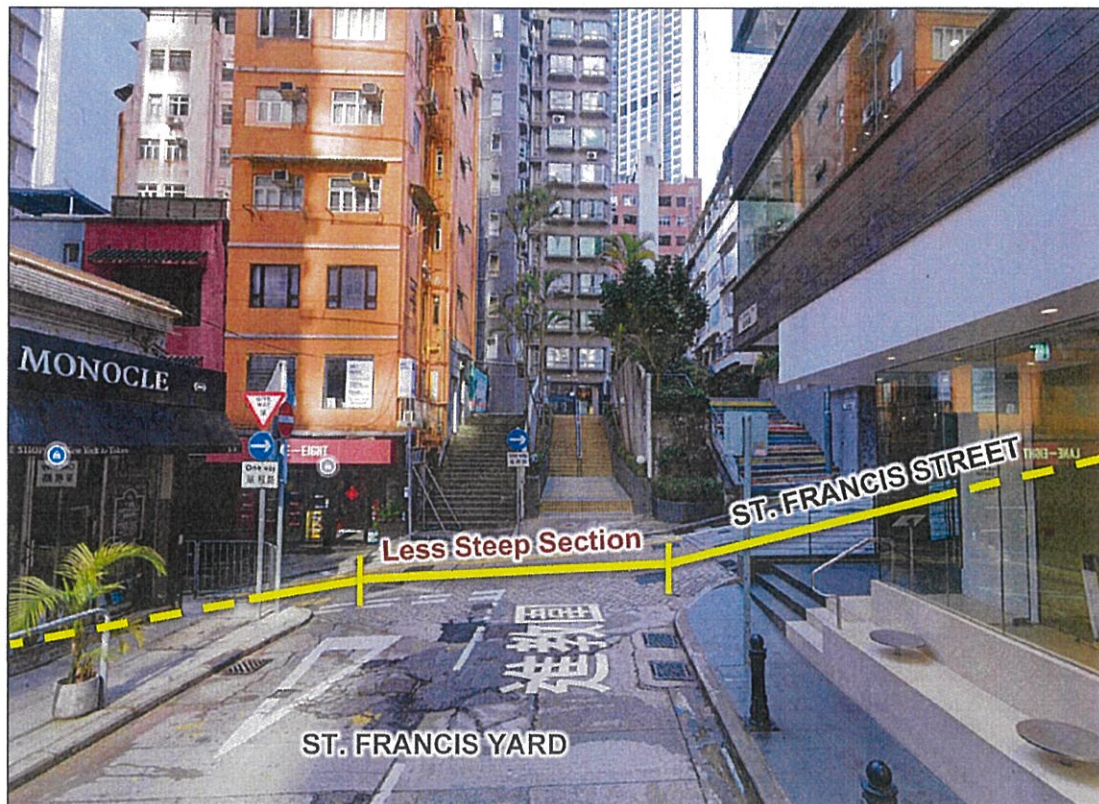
Less Steep Section of St. Francis Street near St. Francis Yard
